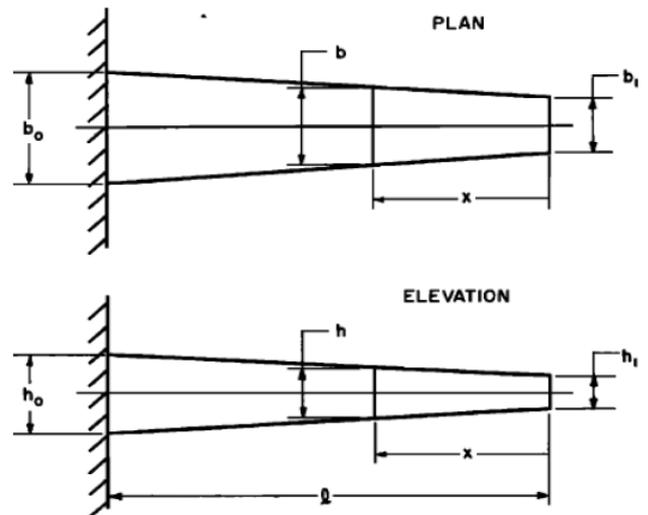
Plan and Elevation view of cantilever tapered beam with linearly varying width and depth
